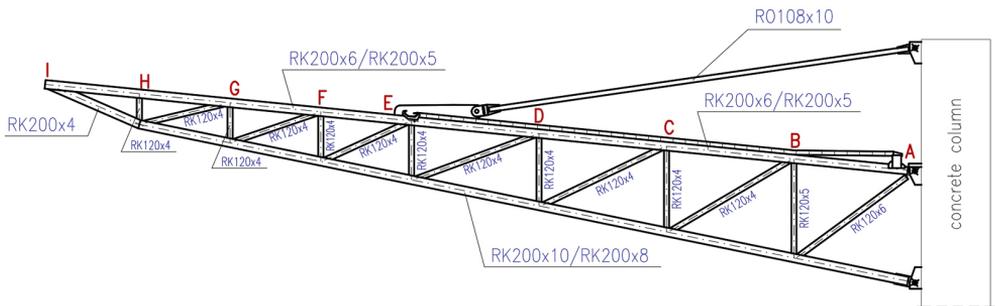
Diagram of the damaged truss girder – upper chord made of square tube RK200
